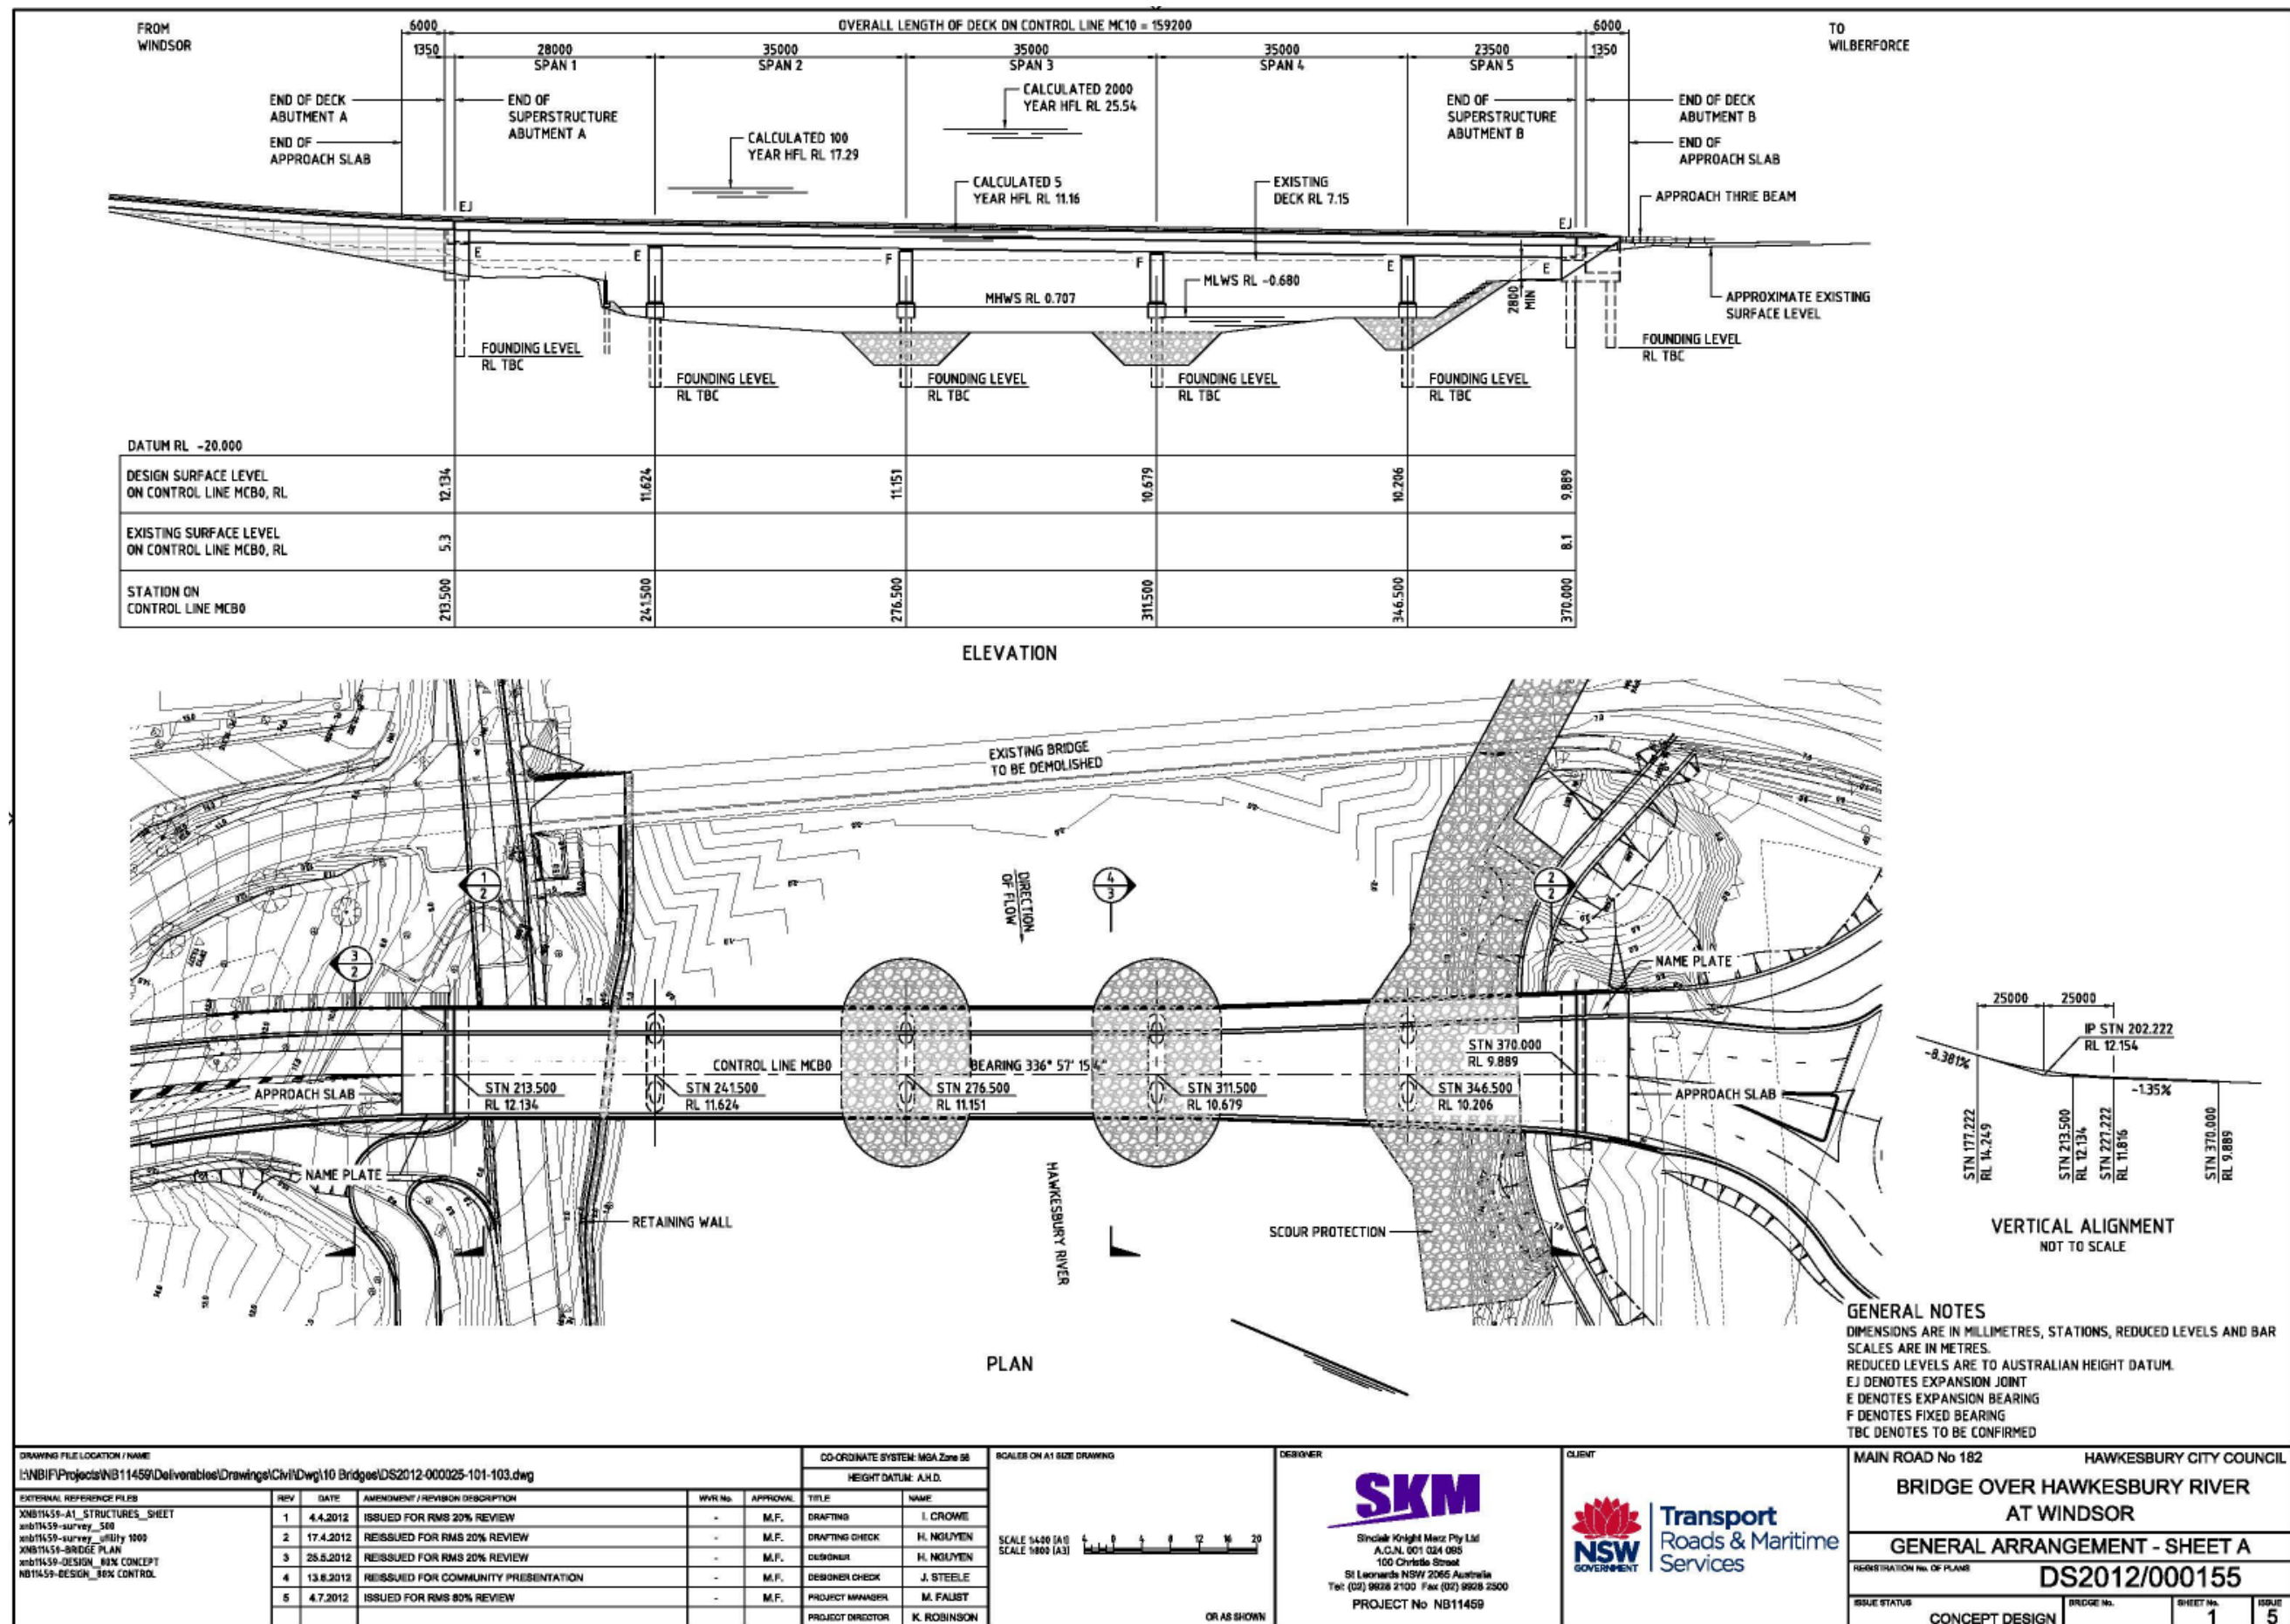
General Design layout of the Bridge crossing across the Hawkesbury River at Windsor (Source SKM).
